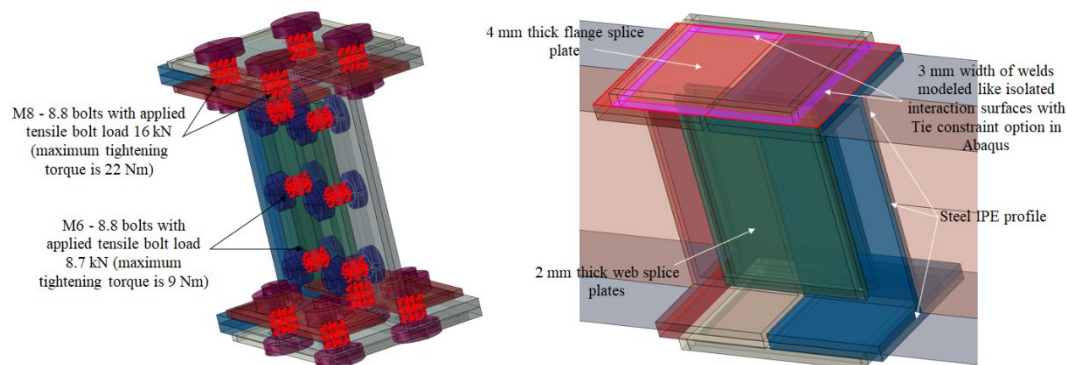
Detail of application of bolt load in Abaqus - left, detail of definition of weld thickness - right
